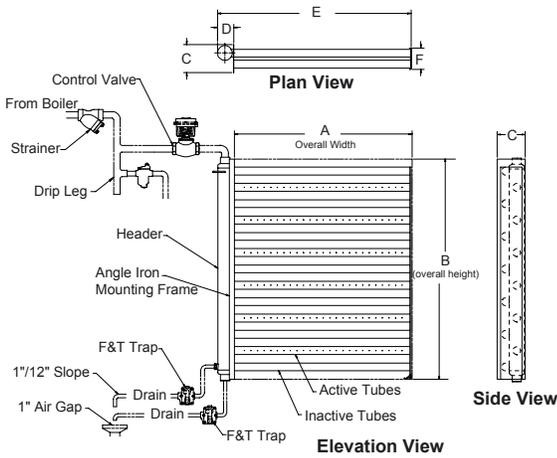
HumidiPack CF. Drain traps discharging to floor drain.
